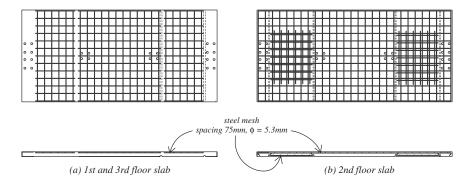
Plan and front view of slab showing reinforcing mesh.
